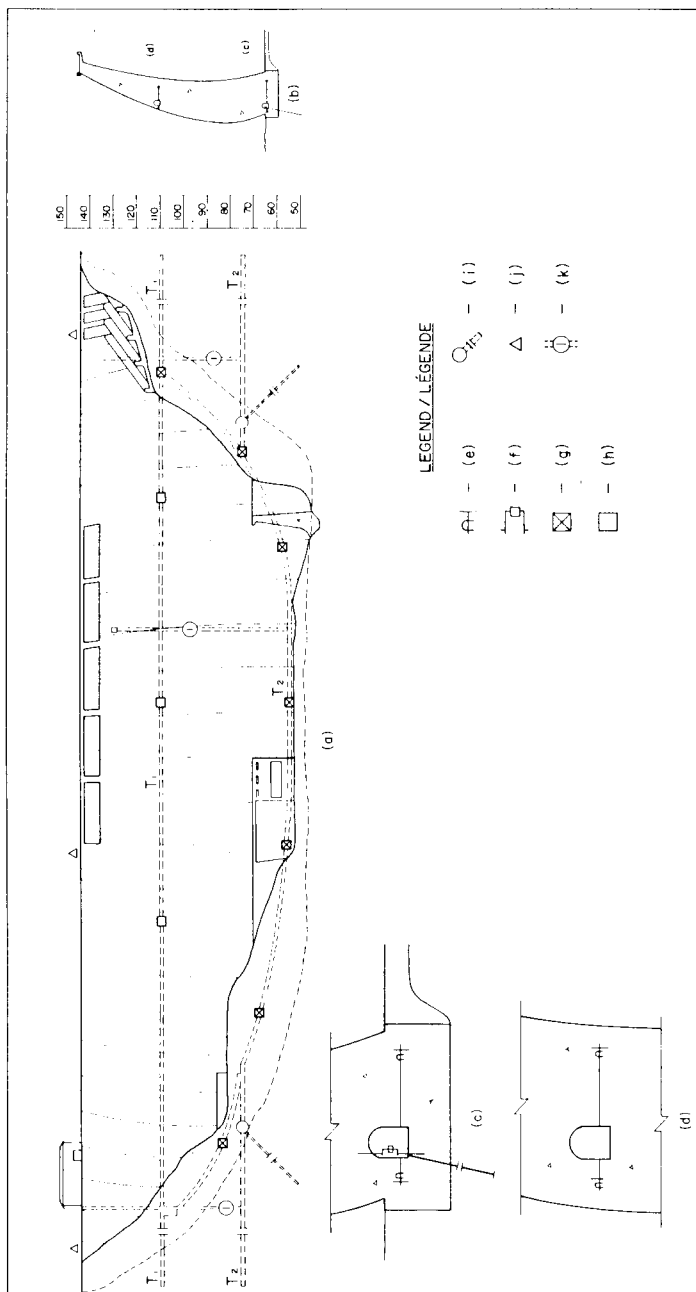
SOME DETAILS OF UPGRADED INSTRUMENTATION LAY-OUT FOR PONGOLAPOORT DAM
